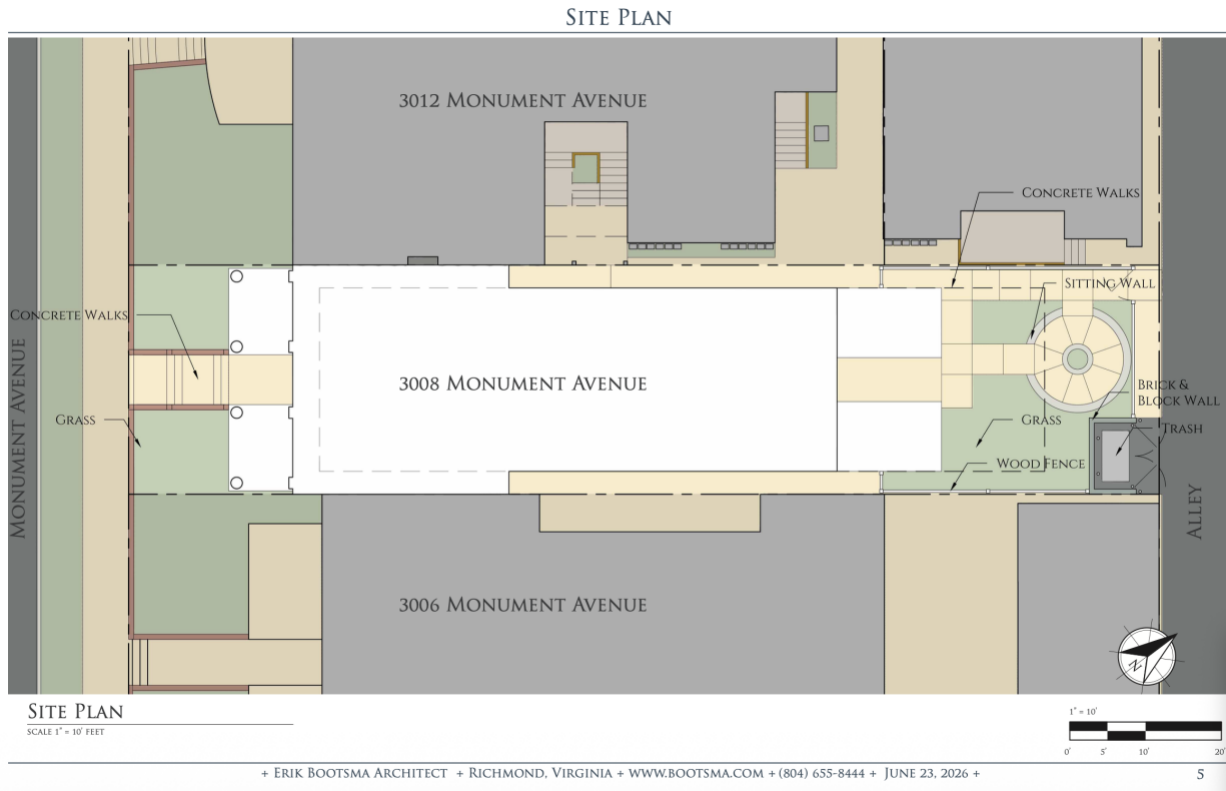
Site plan of proposed multifamily building along Monument Avenue
